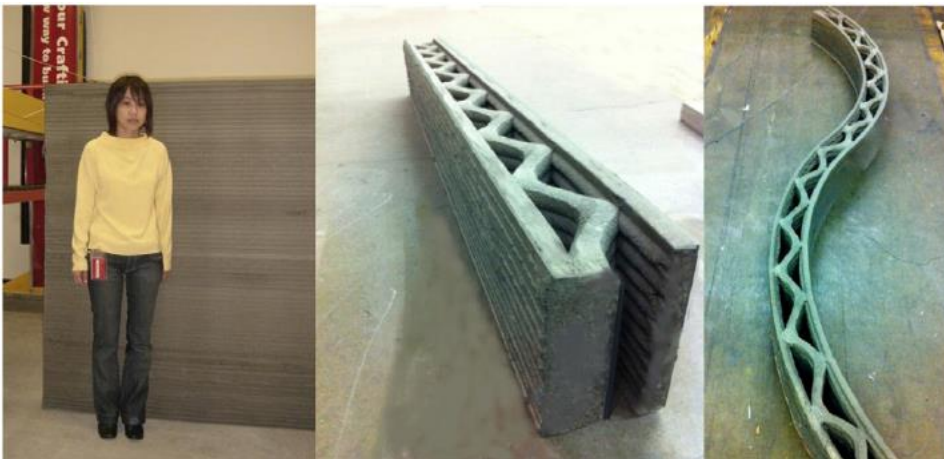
Hollow concrete and reinforcement wall sections from *Optimal Machine Operation Planning for Construction by Contour Crafting
